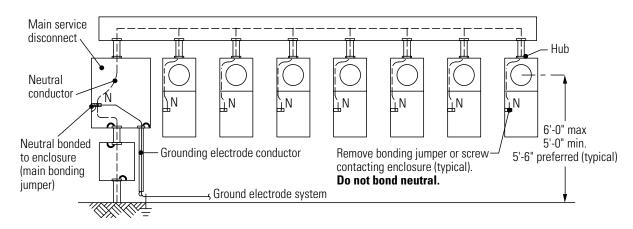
Service entrance grounding and bonding, multi-meter installation with non-metallic conduits.
